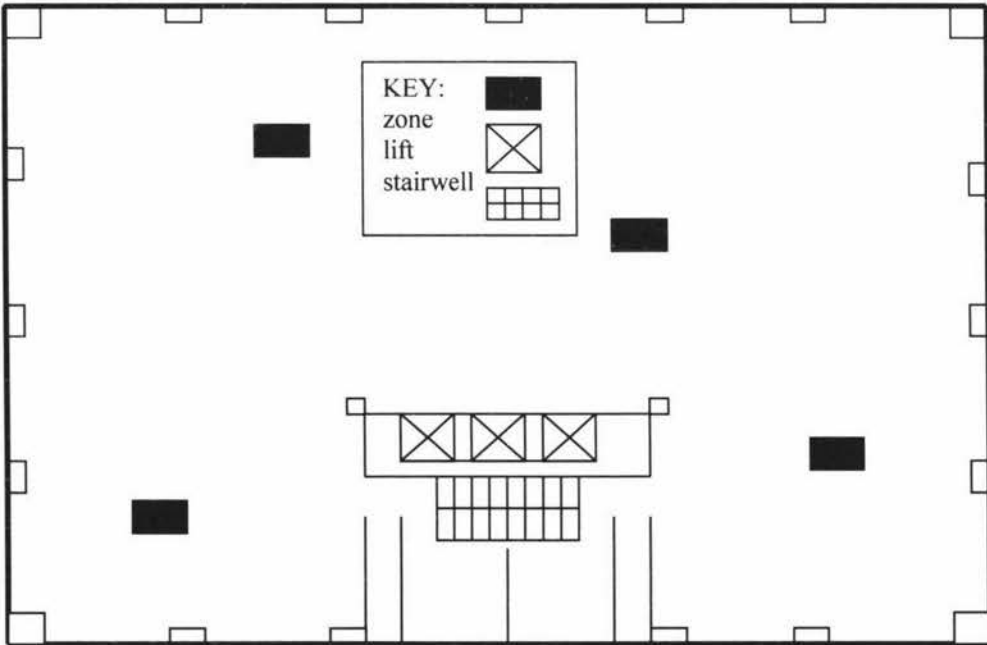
Floor plan of building two outlining the sampling zones selected on all three levels (not to scale).
